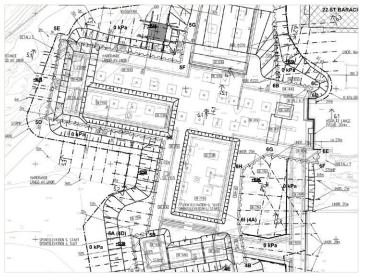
Plan view of building 17. AU 14, AU 18 and AU 23 of varying lengths have been installed around most of the building. The sheet piles are fixed with ground anchors (strands) to the mountain.
